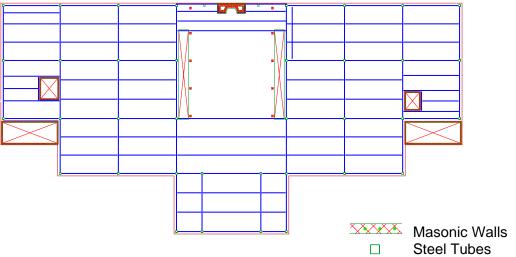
Typical Framing Plan Wooden Columns \boxtimes
